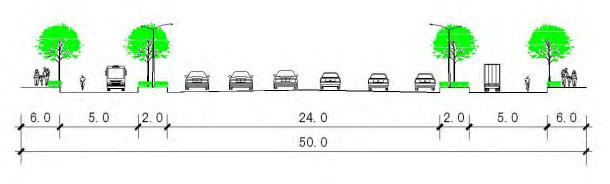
Option One – Cross section of Xihuan Road (Alternative)
